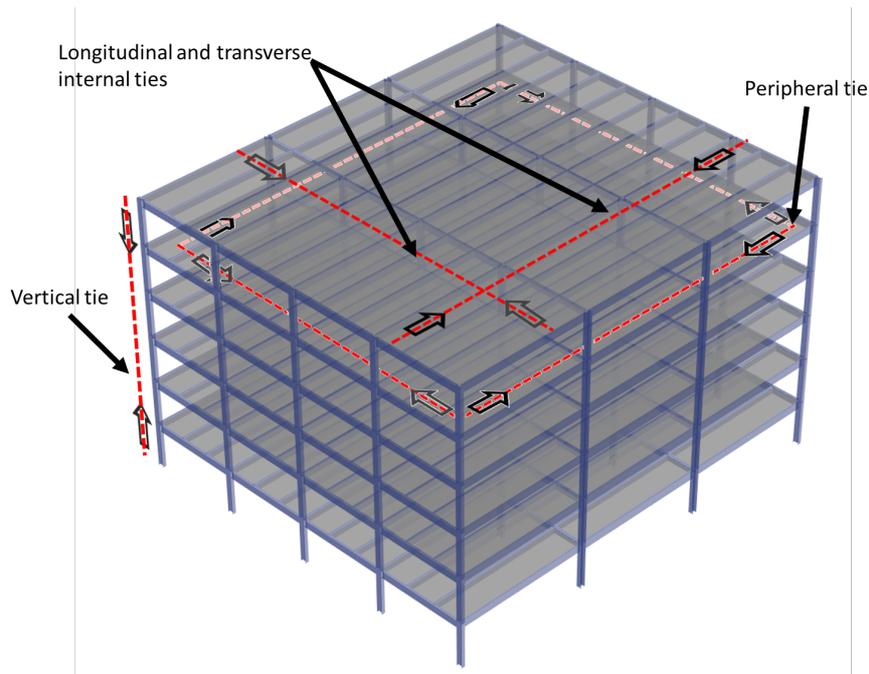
Typical tying for framed structures (Stylianidis, 2011)
